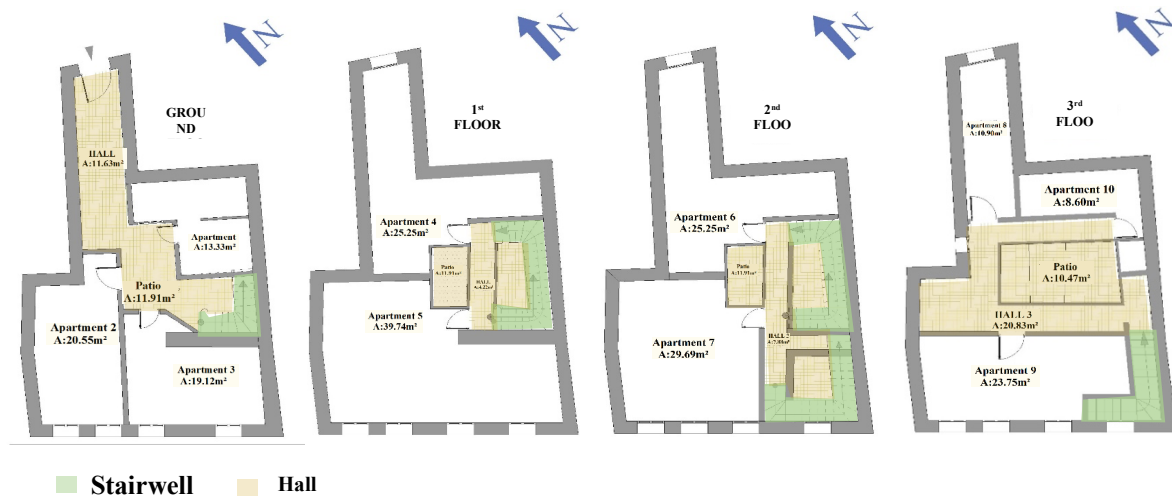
Ground floor plan, 1st, 2nd and 3rd floor code 439.
